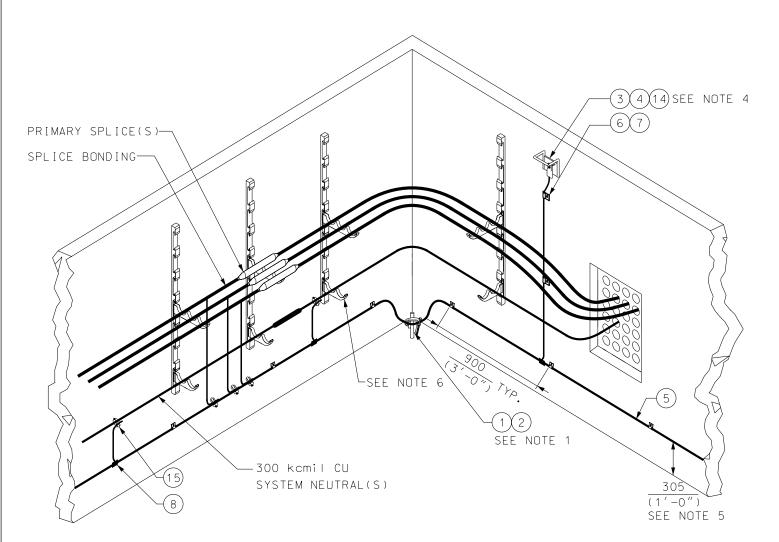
DOWNTOWN CABLE CHAMBER GROUNDING SYSTEM (CAST IRON CABLE RACKS AND ARMS INSTALLATION) &
